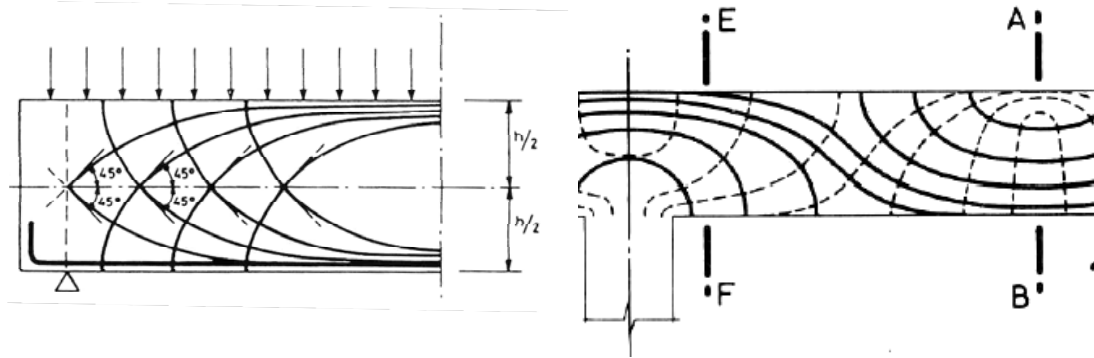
Compression and traction lines in simply supported and continuous beams before cracking (adapted from Calavera [191])
